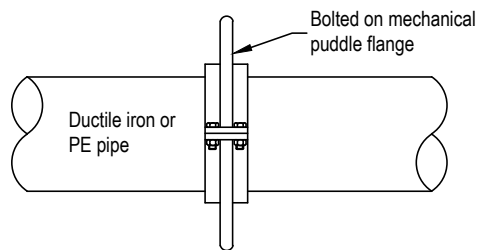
B-B: MECHANICAL PUDDLE FLANGE CONNECTION
